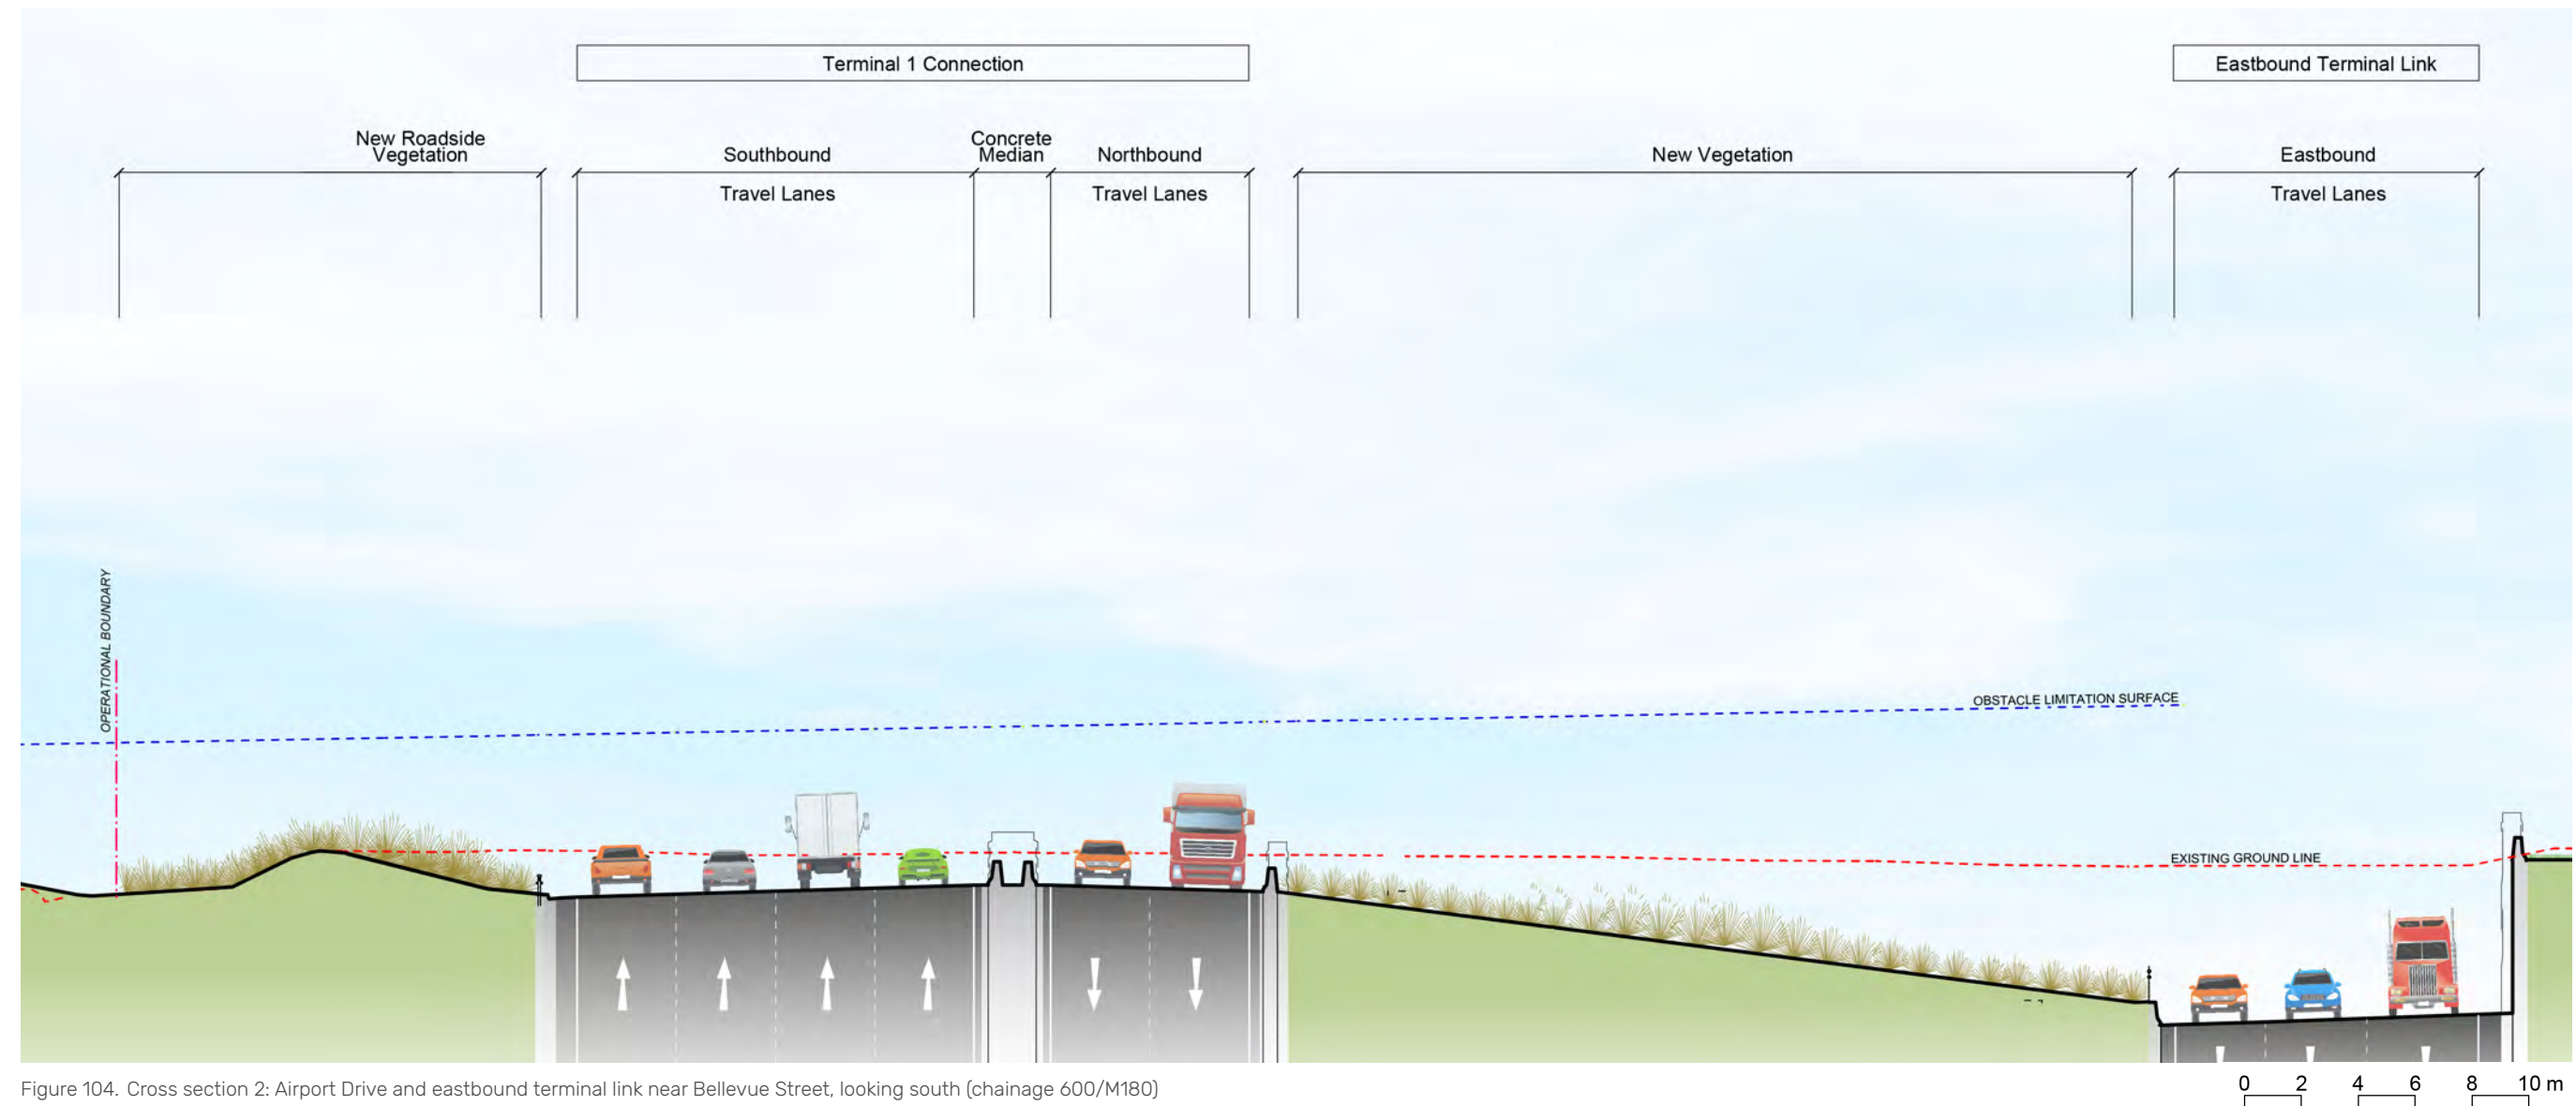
Cross section 2: Airport Drive and eastbound terminal link near Bellevue Street, looking south (chainage 600/M180)
